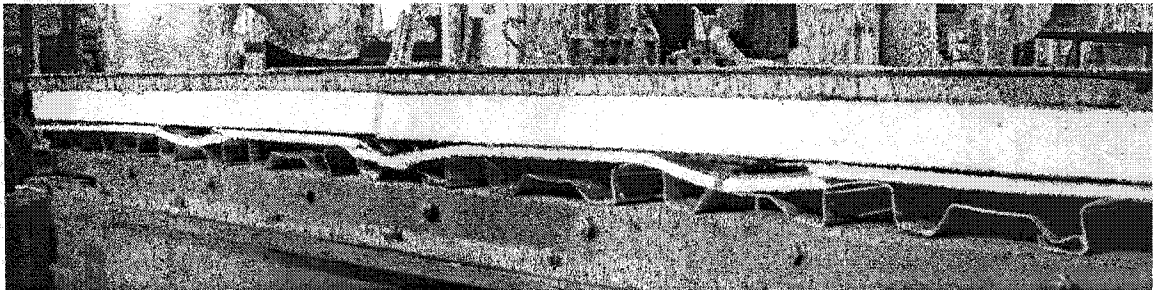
Steel deck flute height diminished, gypsum board cracked
